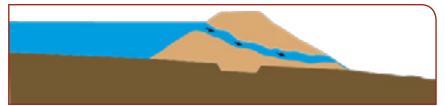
Dam walls constructed with dispersive subsoils, subject to failure by tunnelling
